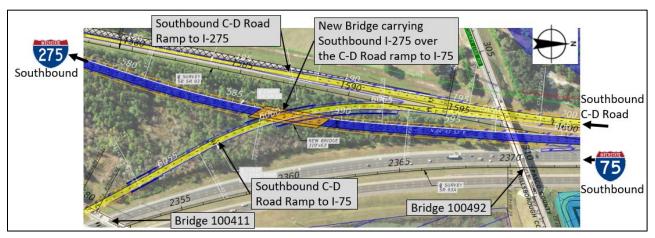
Preferred Alternative—C-D Road Diverge & New I-275 Bridge over C-D Road Ramp
